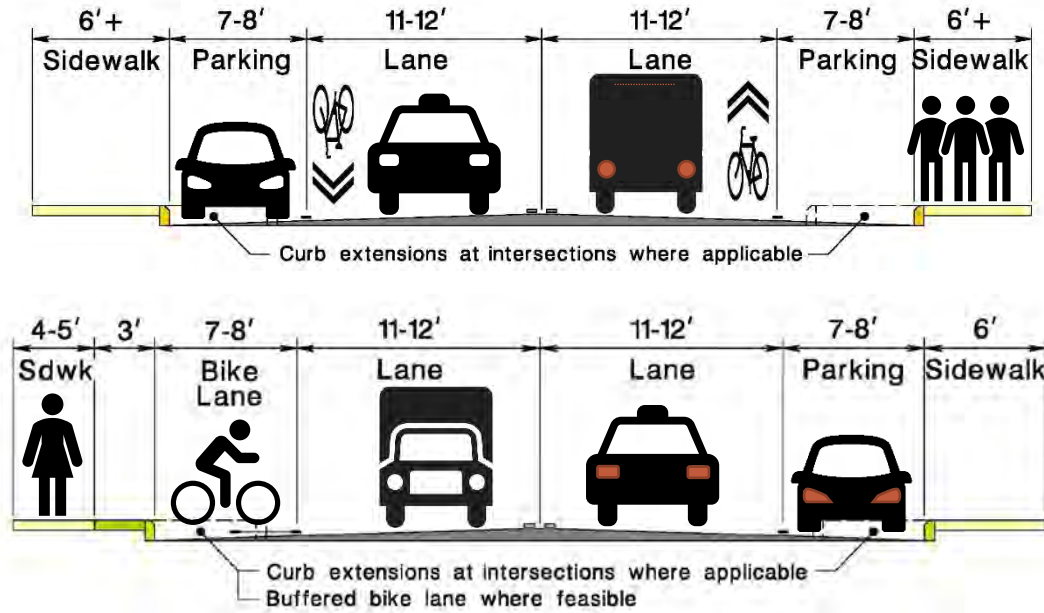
Conceptual Cross Sections based on Recommendations (South Orange)
